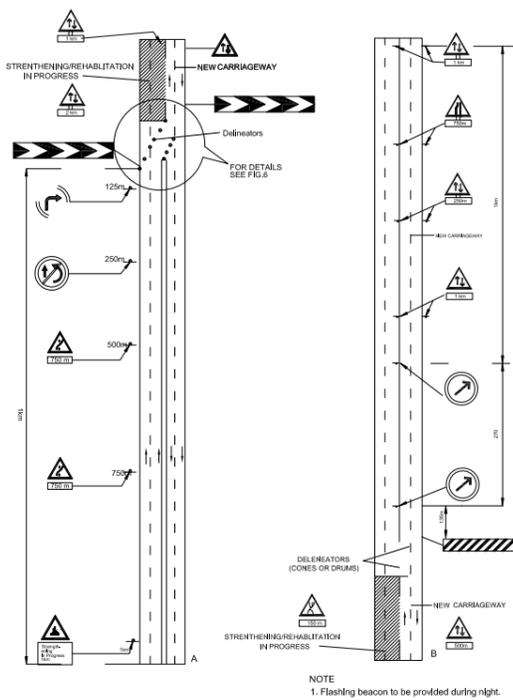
Layout of signs for traffic diversion from Existing Carriageway to New carriageway for Strengthening/ Reconstruction From One Median to other Median
